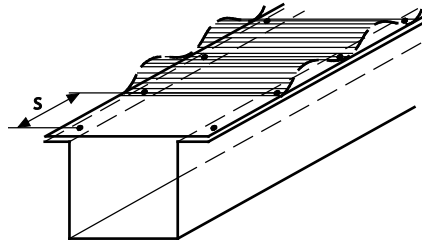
Spacing of Connectors in Composite Section
